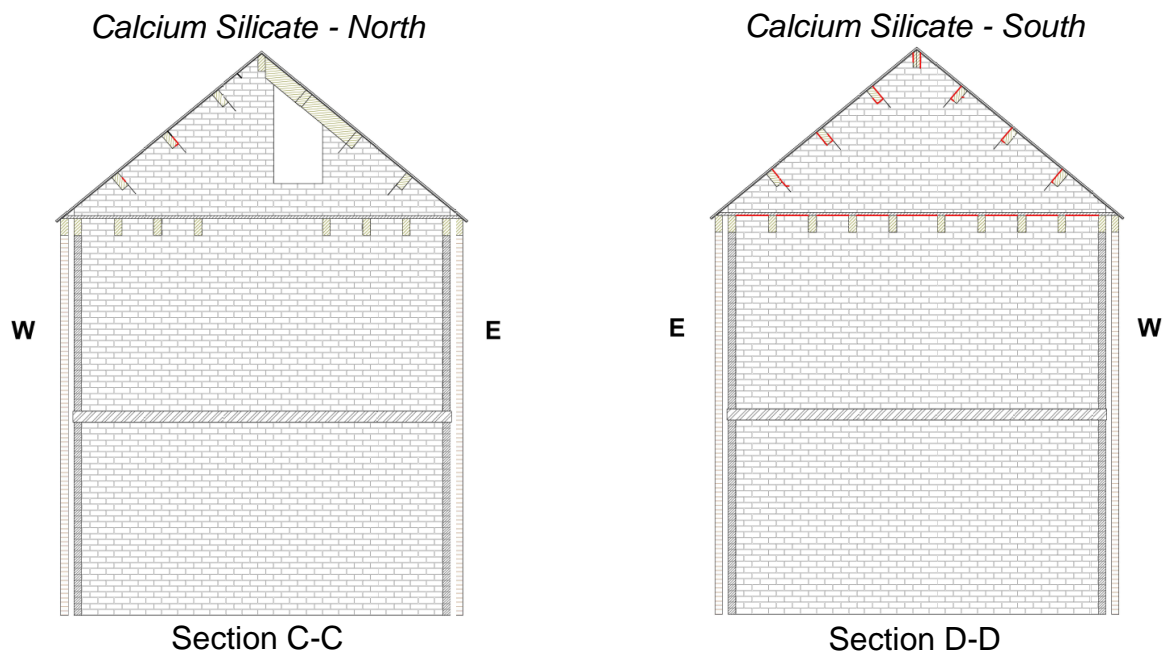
EQ-NPR 20% cracks - Calcium Silicate transversal walls.
